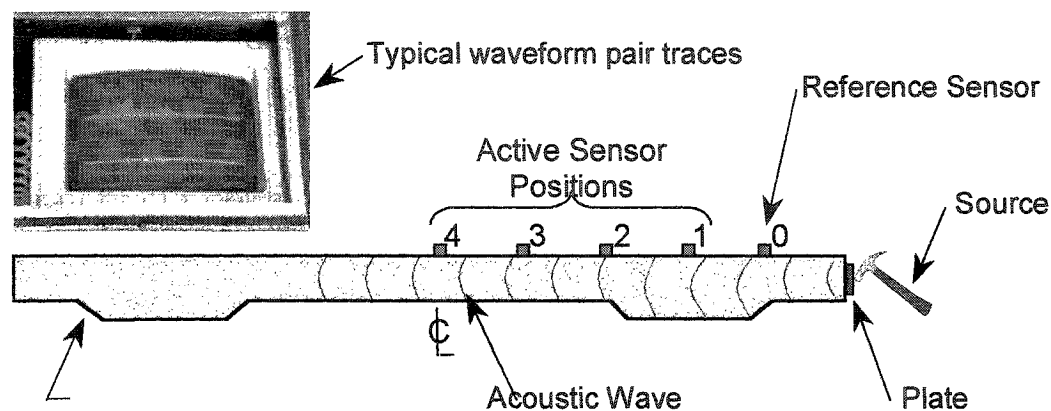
A Schematic View of Acoustic Survey Set-Up on the Cross-Section of Deck Slab
